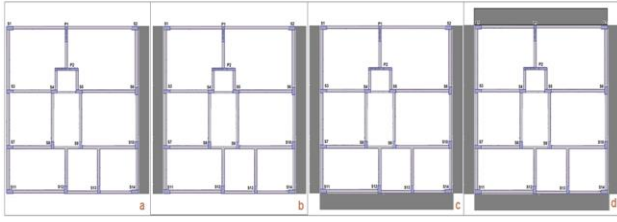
Structural models with heavy overhangs added to their facades a) one facade, b) two facades, c) three facades, d) four facades
